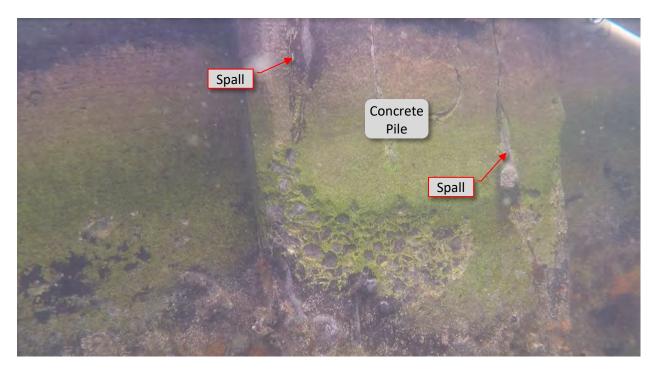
P23. STA 4+28. Spalls at both flanges at pile.
